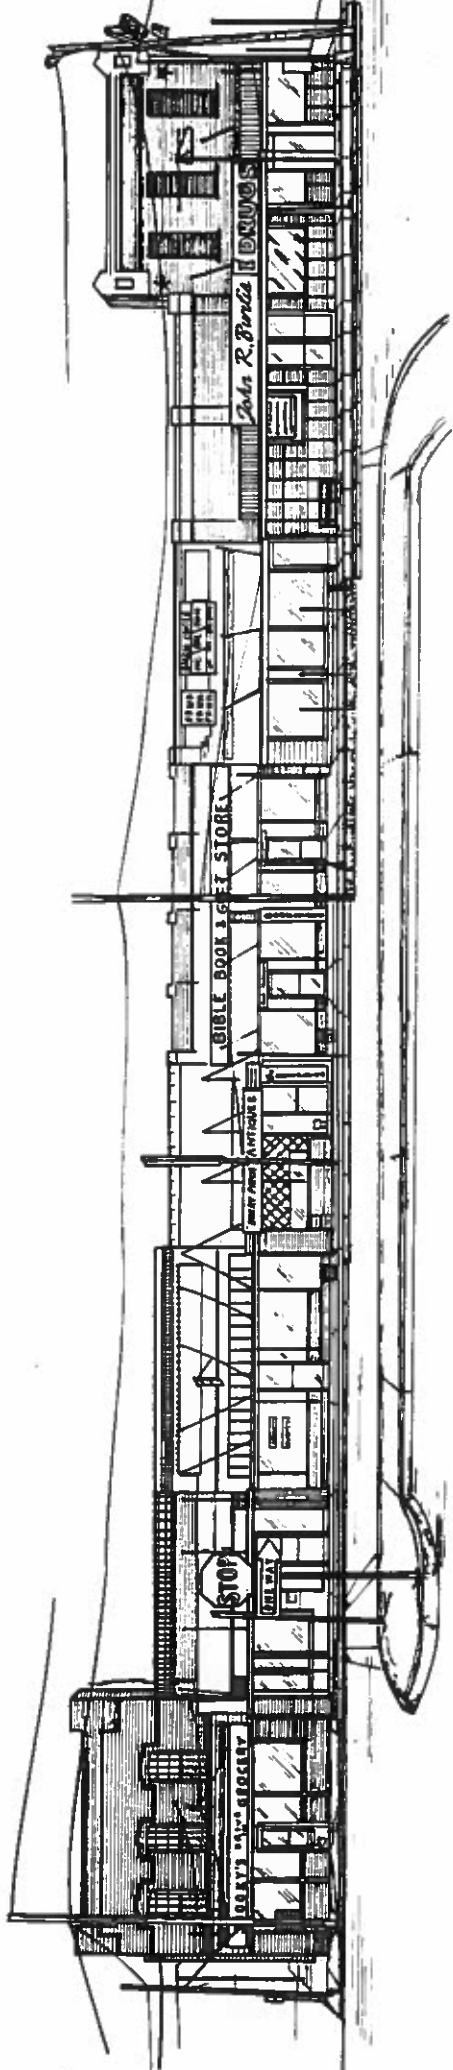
Building Facade Design Alternatives for Main Street - Looking to the North
